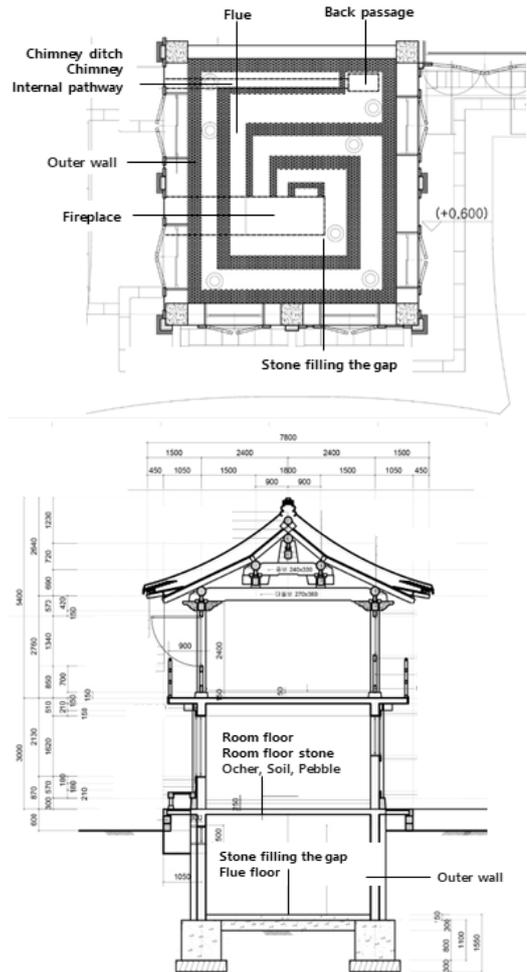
Housing 7 drawing - gudeul plan, Cross-section
